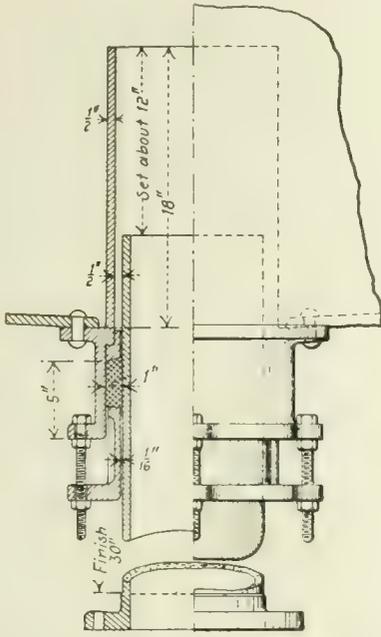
Example of Proper Design of Expansion Joint for Steel Water Tank.
